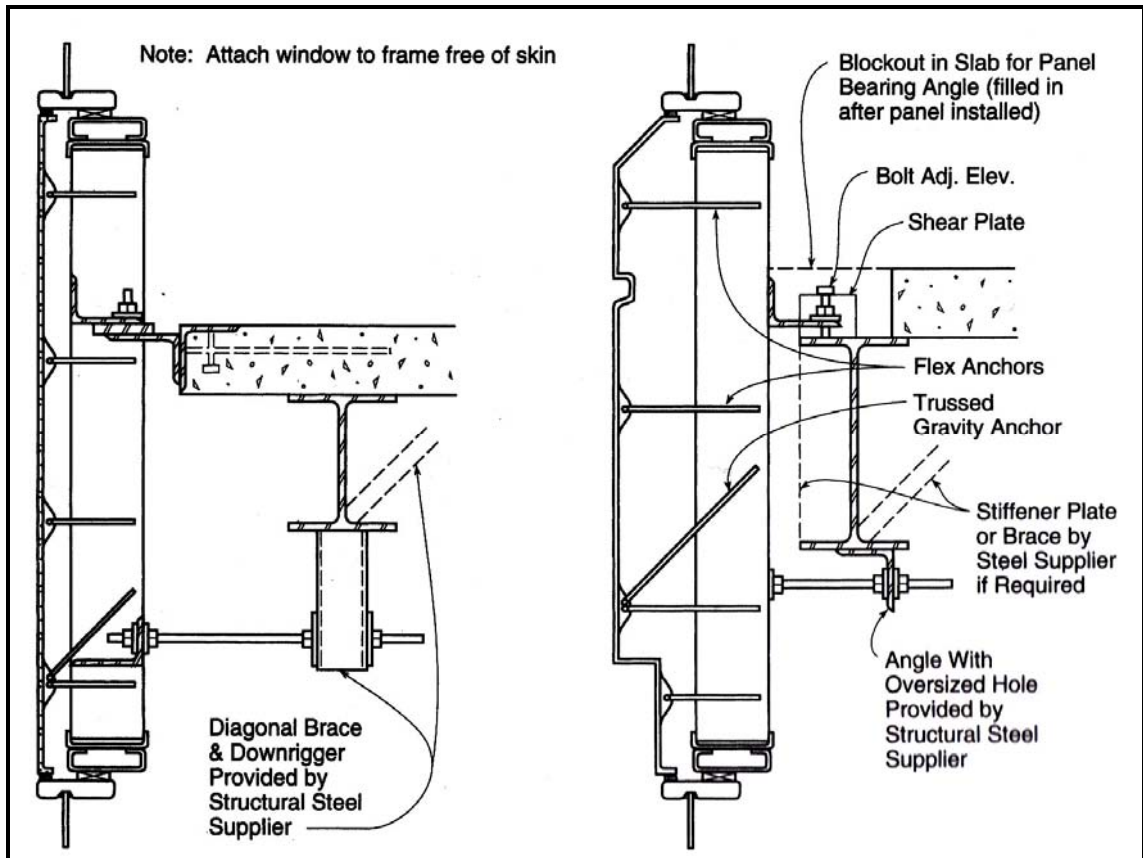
Typical connections of GFRC panels to a steel building frame (Source: Allen 2004)
